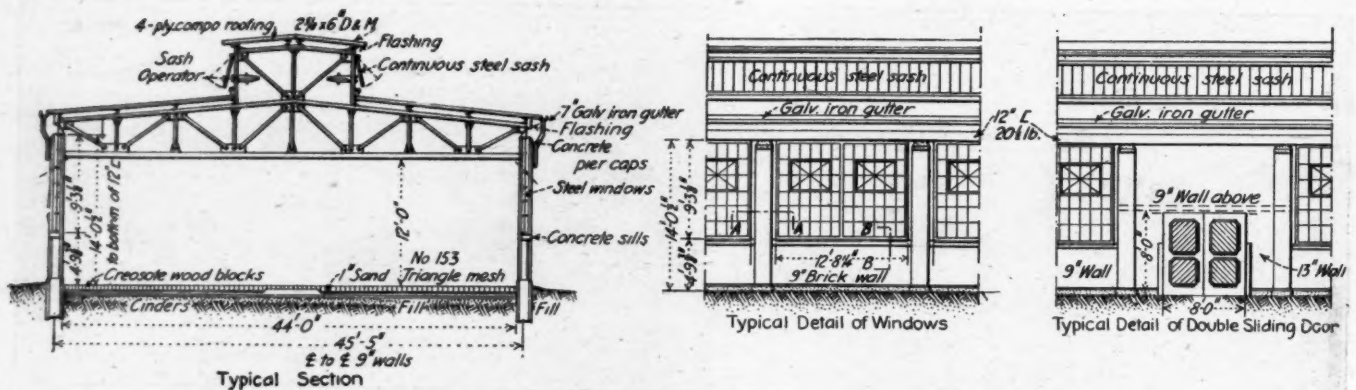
ELEVATION DETAILS AND CROSS-SECTIONAL ELEVATION OF MACHINE SHOP
